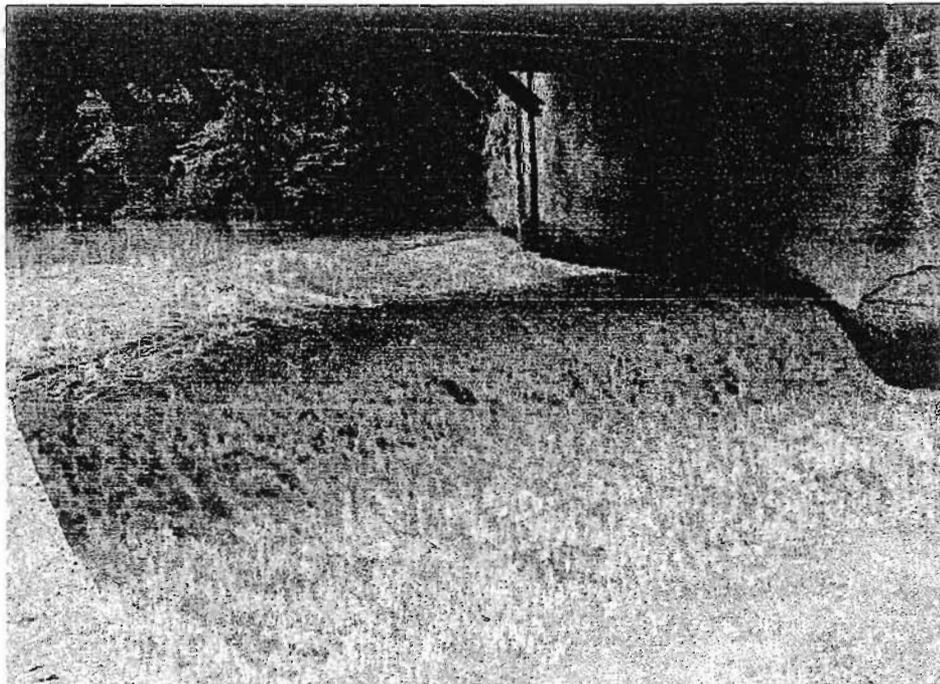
Downstream side of the Coloso dam. Drop during lower flows (photo condition) approximately 2 meters including a lower step not shown in the photo. Note that the vertical sidewalls have a wetted zone.
